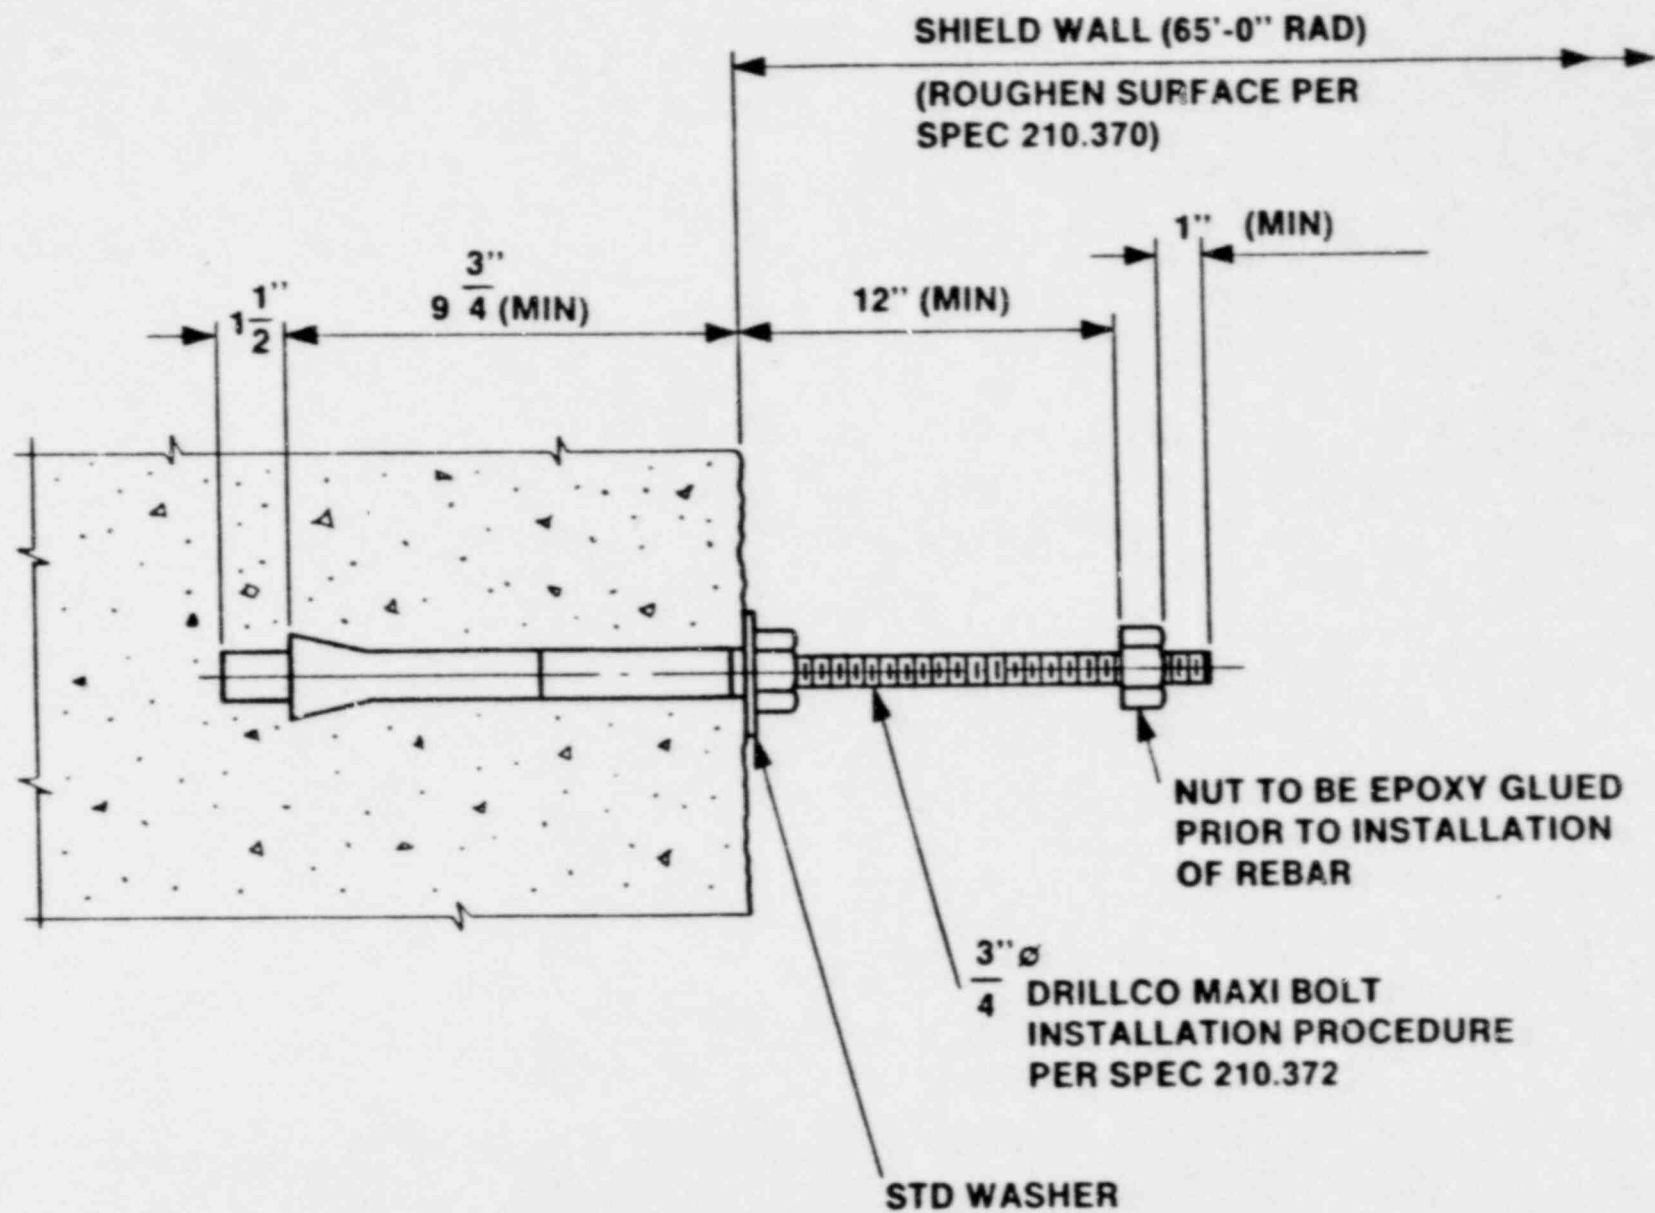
DESIGN DETAILS OF THE CONCRETE FILL
